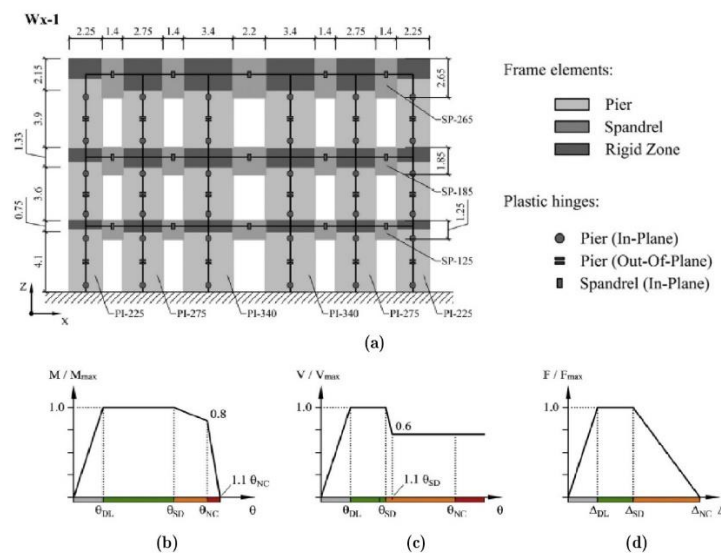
Equivalent Frame Model of a masonry building: (a) Hinges position, constitutive laws of the (b) pier in-plane, (c) spandrel and (d) pier out-of-plane elements (Petrovčič and Kilar 2013).
